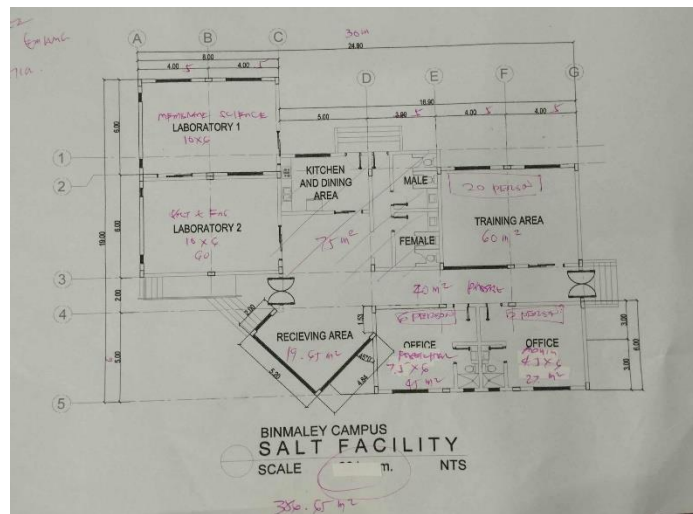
Building Design and Floor Plan (PSU Binmaley Campus)
